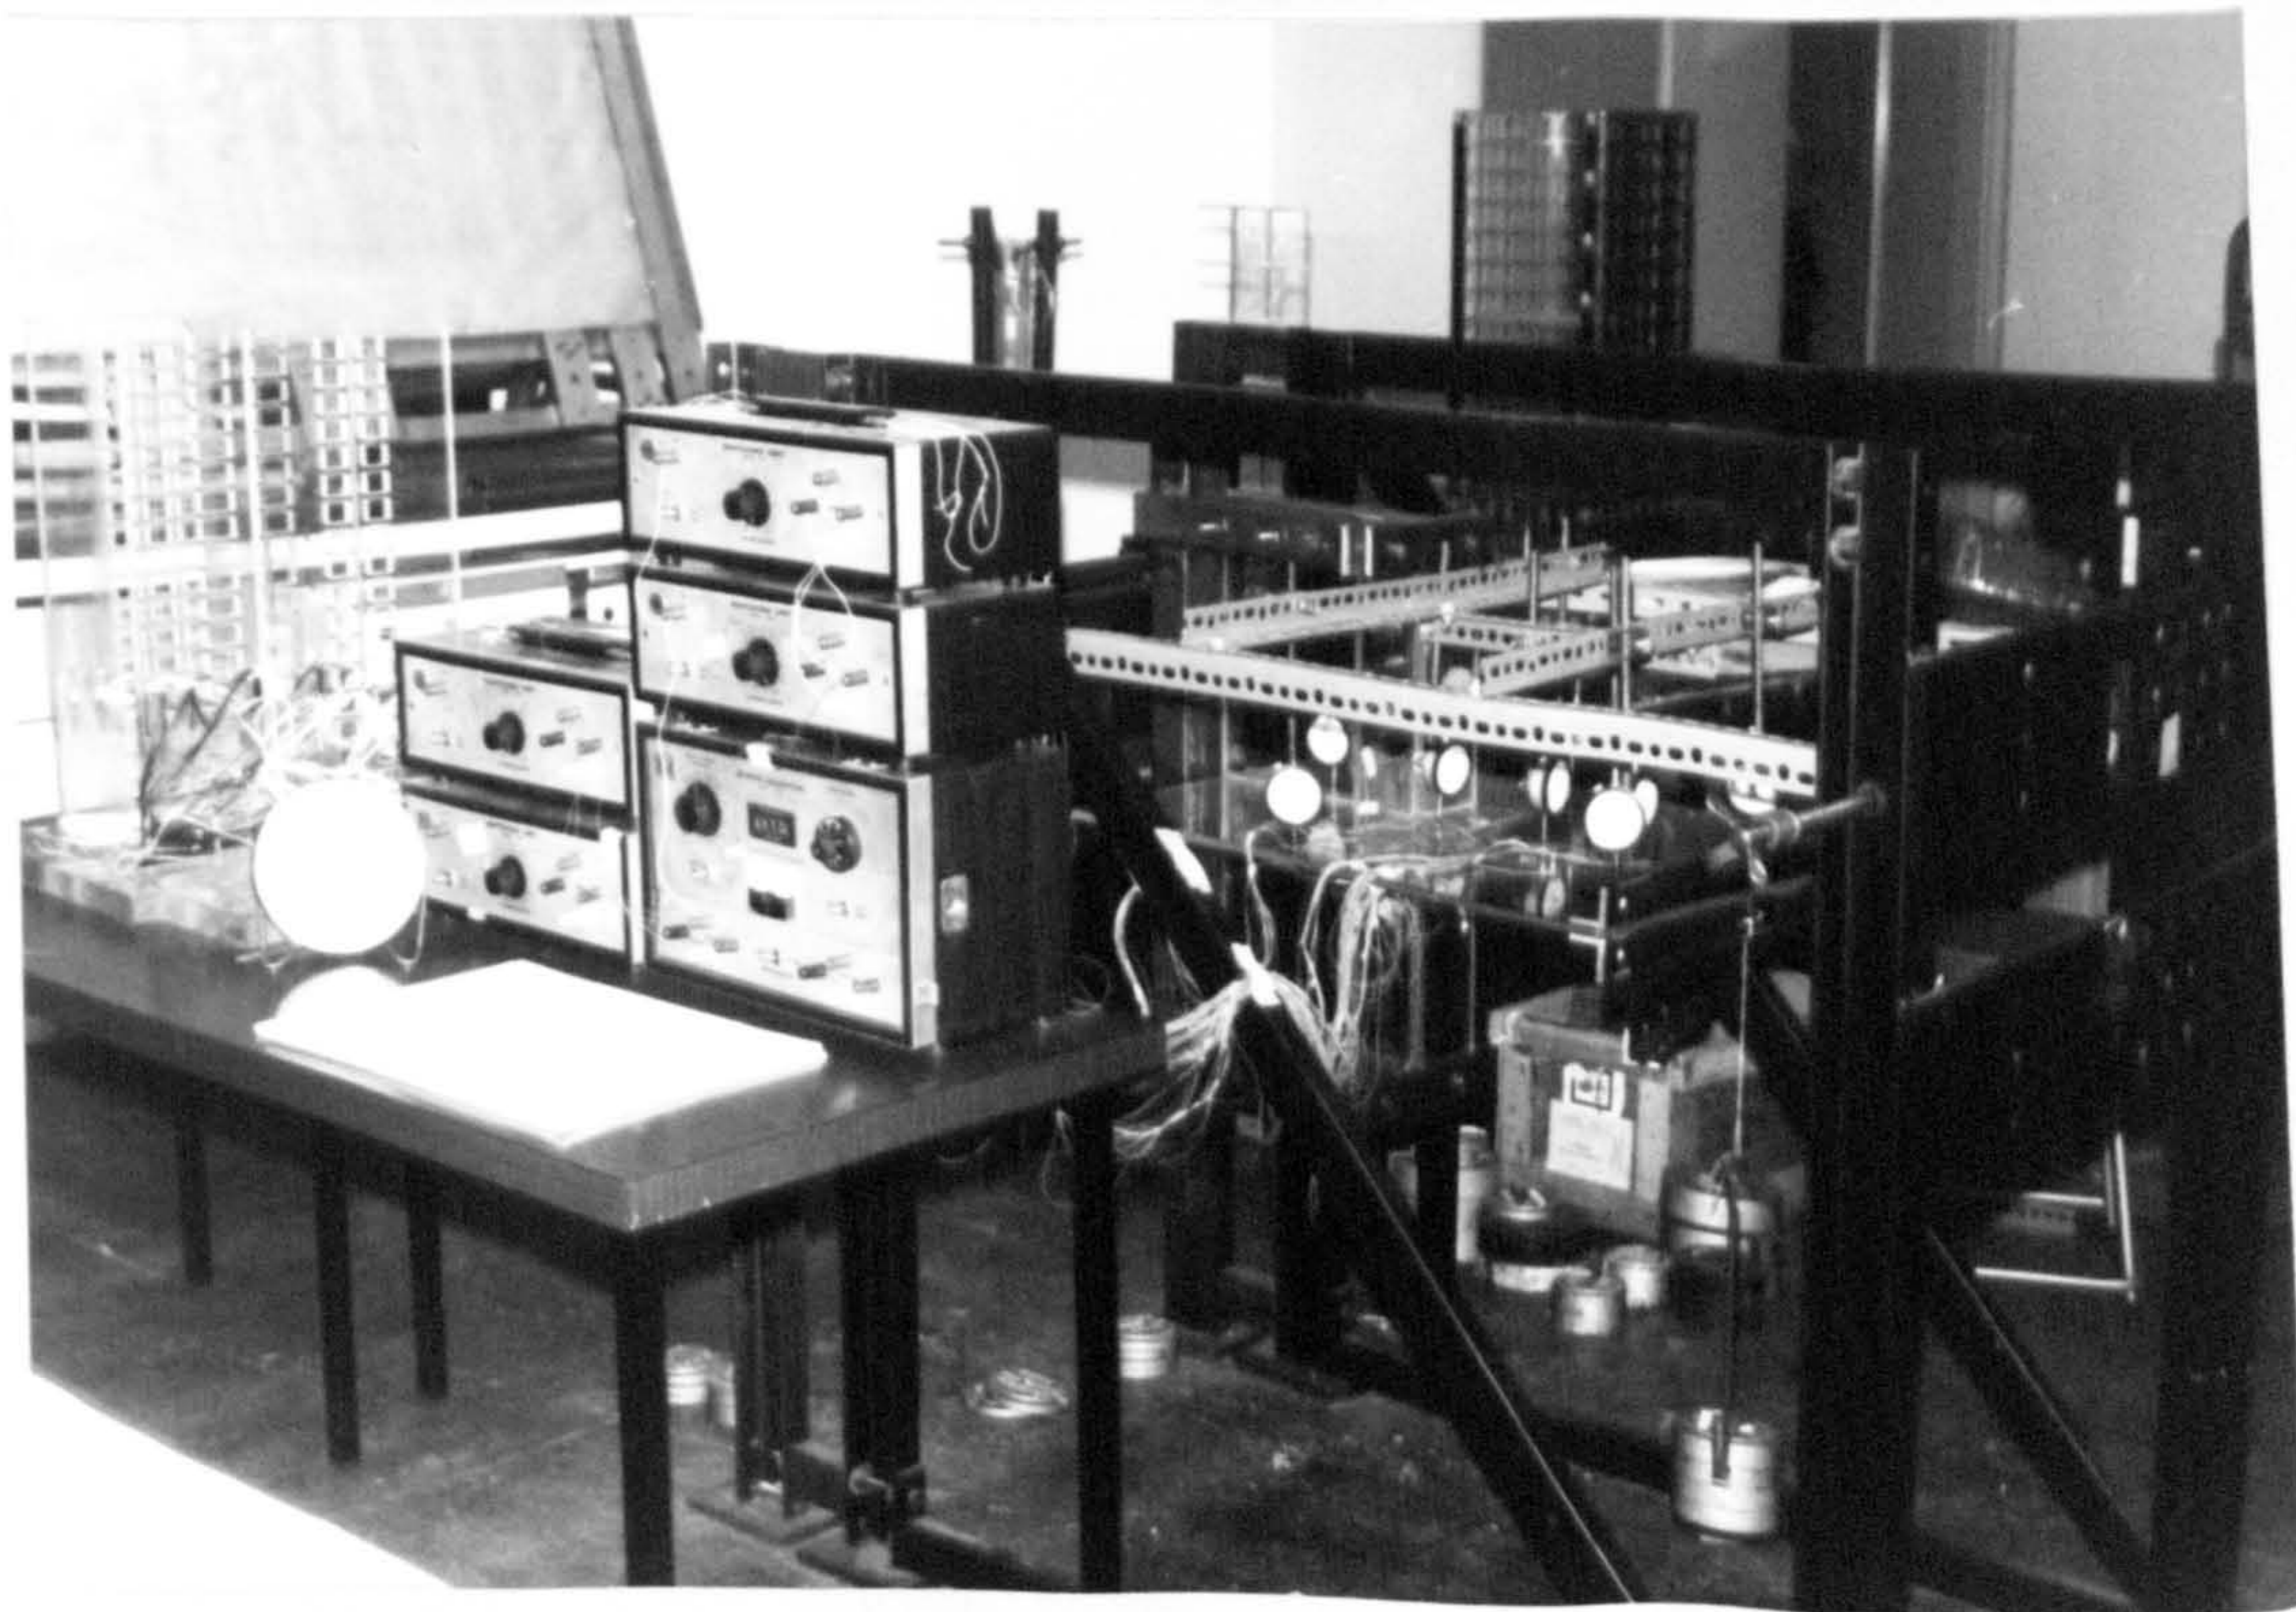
(b) Flanged Wall-Slab Model Under Test
